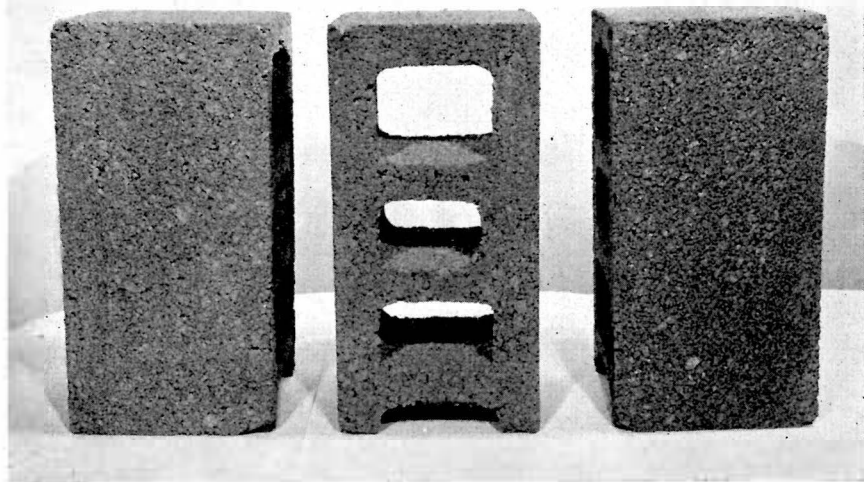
Standard size concrete blocks of expanded Virgin Creek shale
